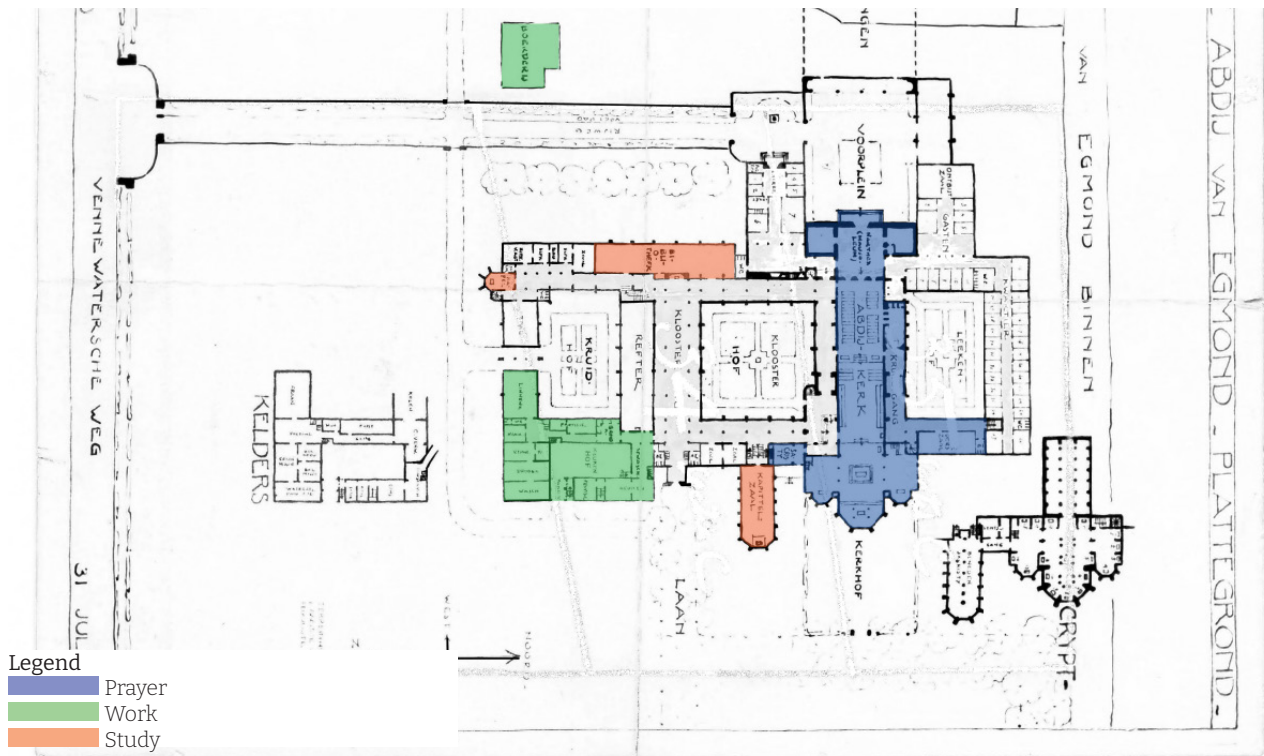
1930 floor plan: The three pillars of the Benedictine Rule highlighted.
